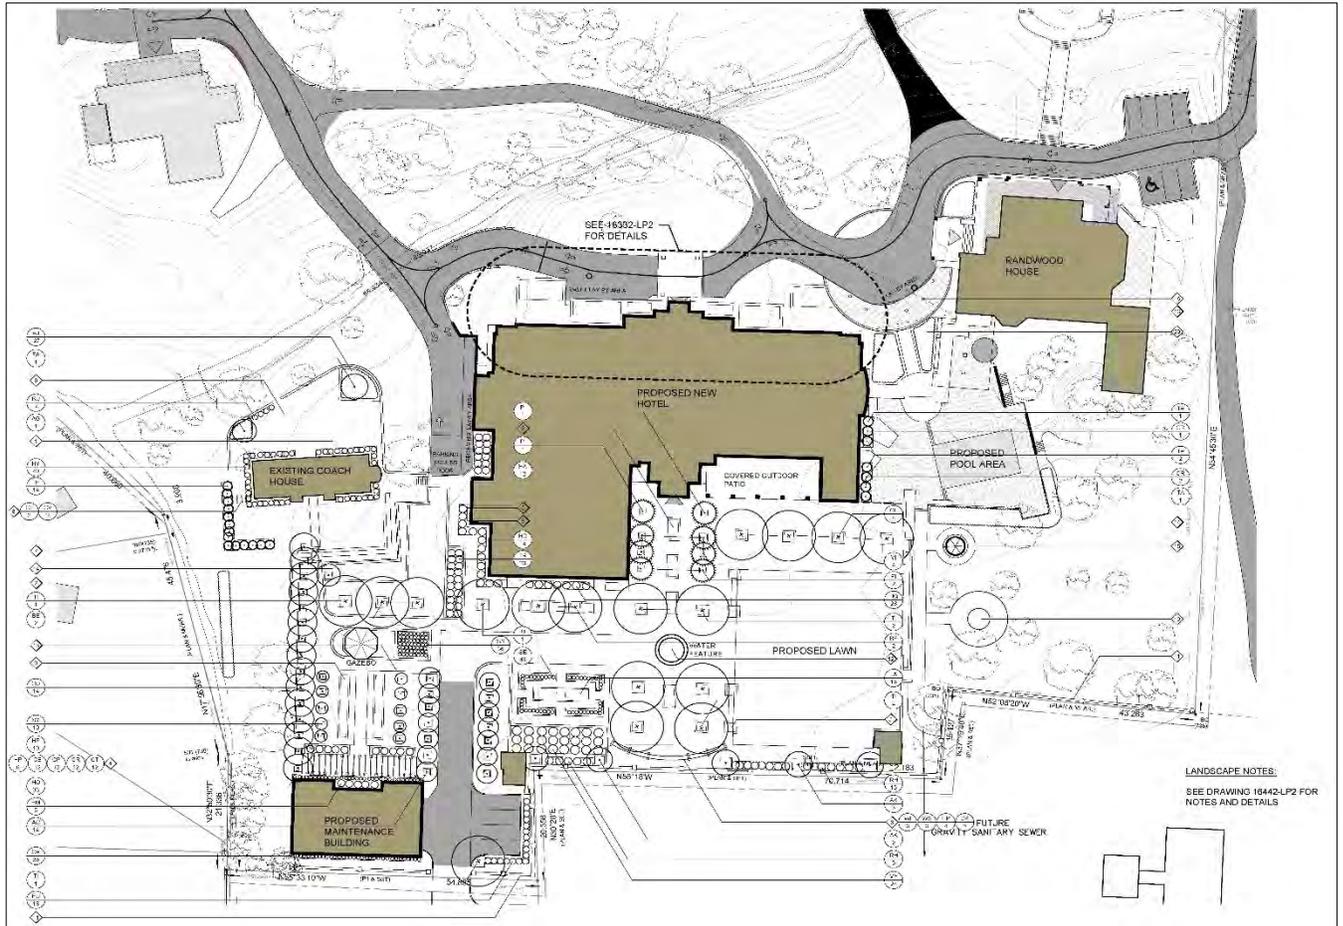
General Arrangement Landscape Plan: New planting and incorporation of preserved plants around the hotel.
